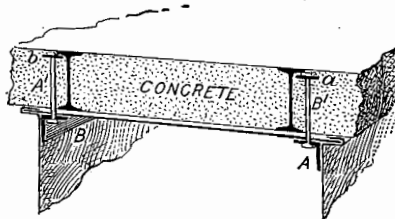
Using the Angle Iron Frame Inside of Top Casing
